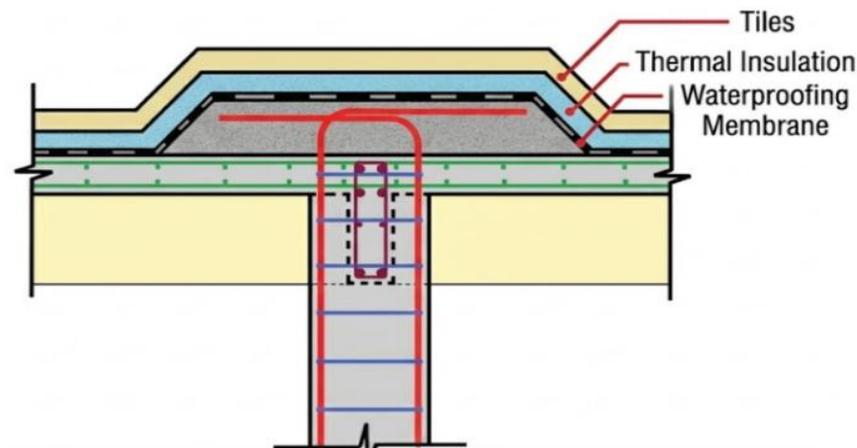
Detail of waterproofing and thermal insulation continuity at column penetration through the roof slab
